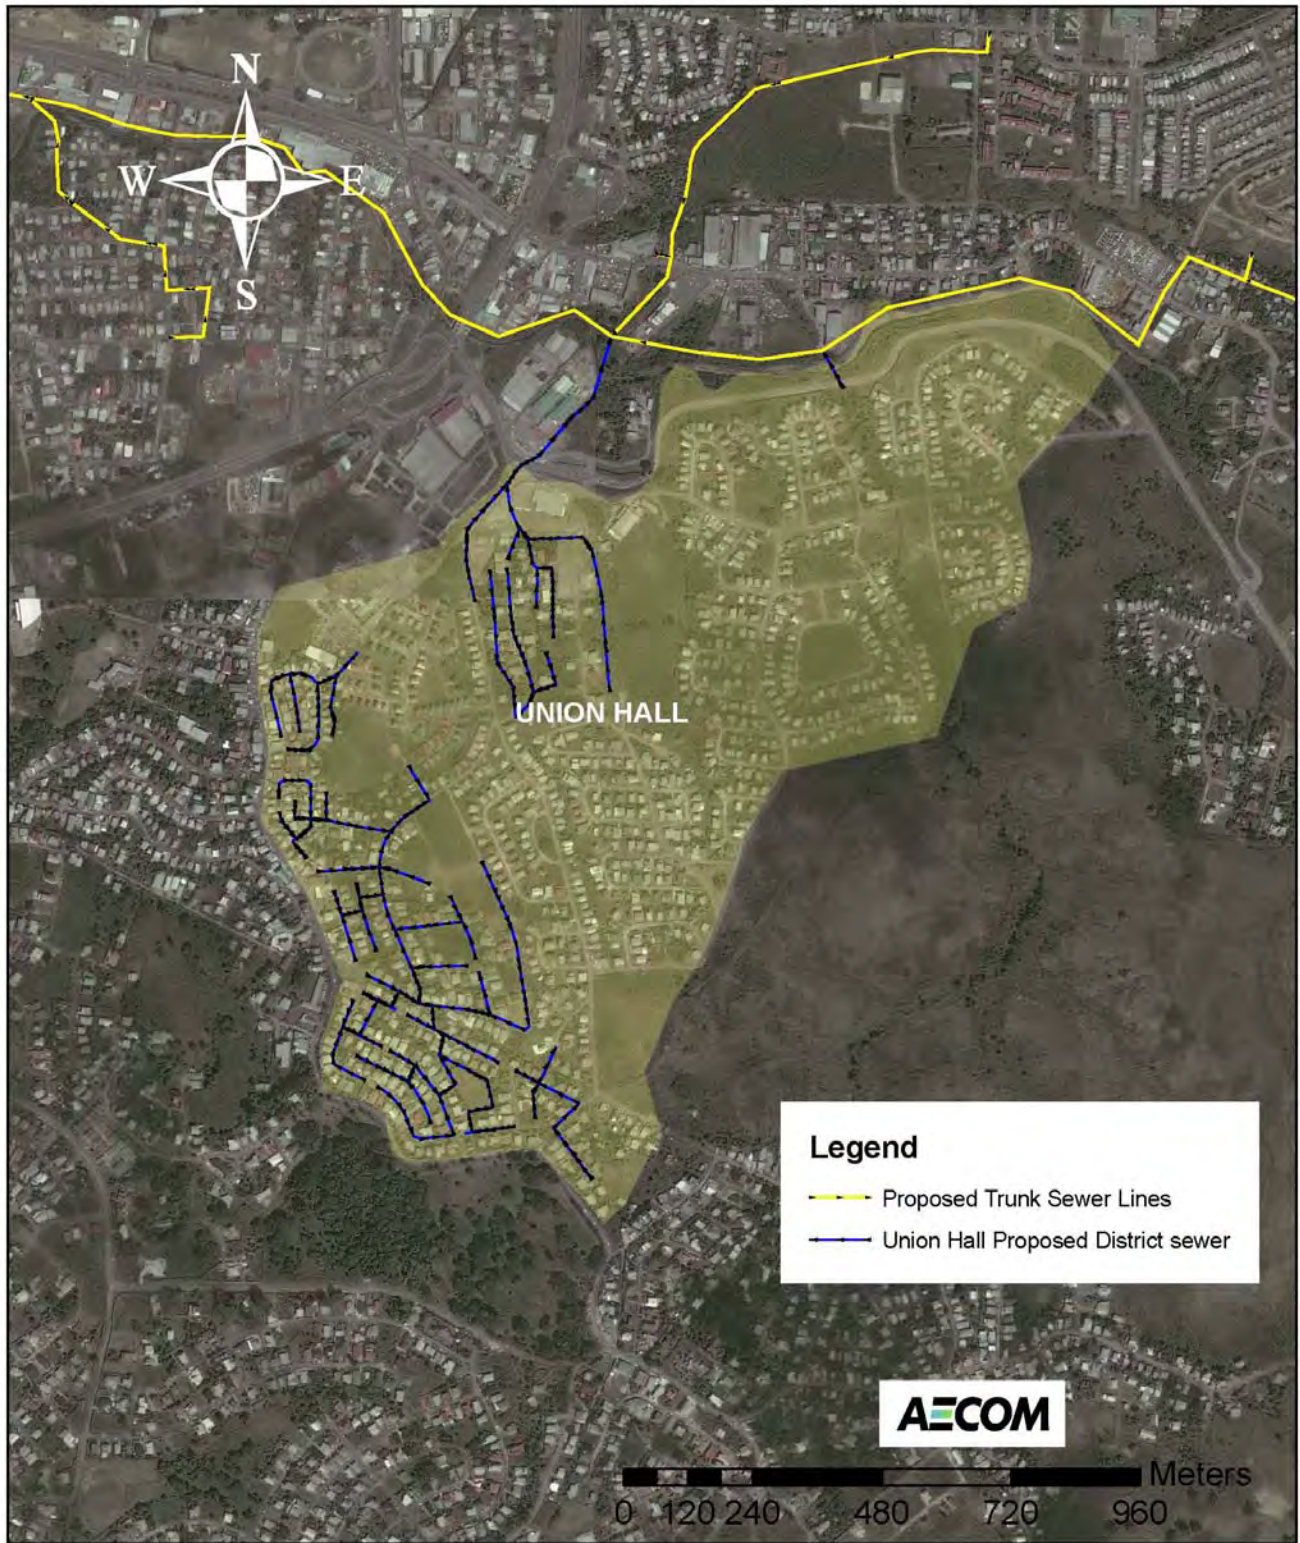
Union Hall Subcatchment New Sewer Layout
